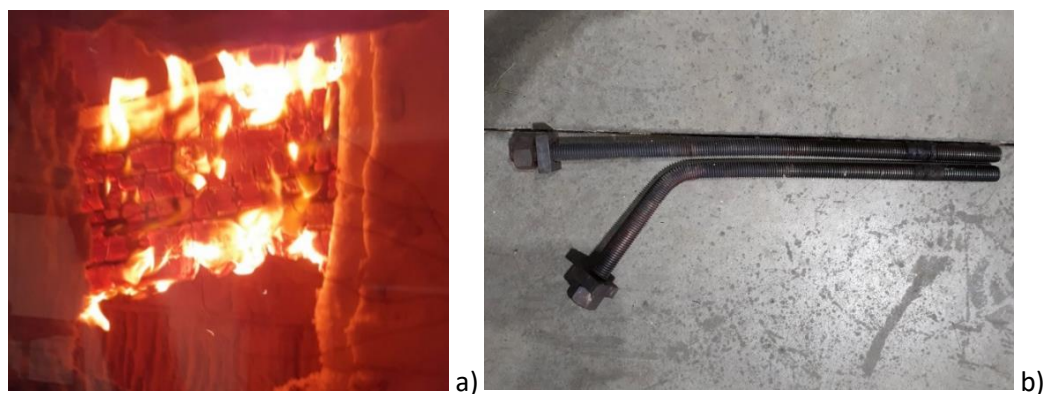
a) Test 250-1.5-A connection just after failure; b) Test 250-1.5-A steel rods after failure
